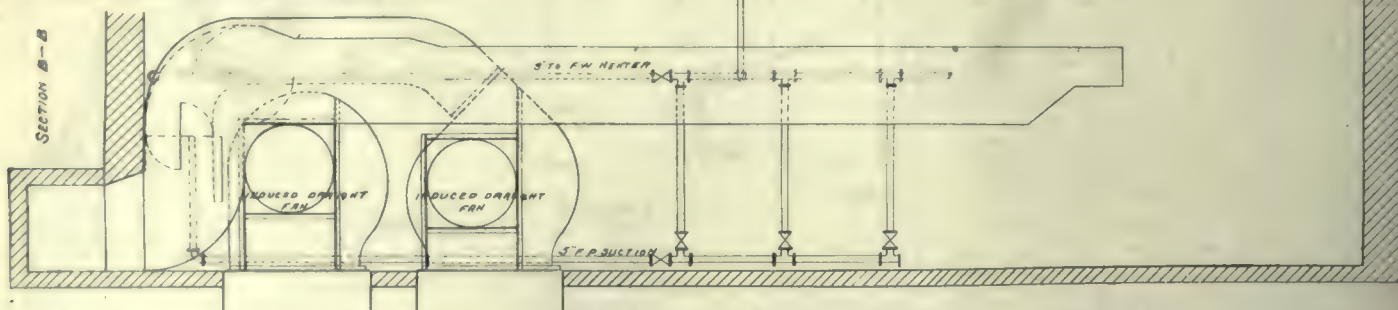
ELEVATION OF INDUCED DRAUGHT EQUIPMENT SHOWING SMOKE BREECHING, FAN CASINGS AND SECTION OF SMOKE TUNNEL
